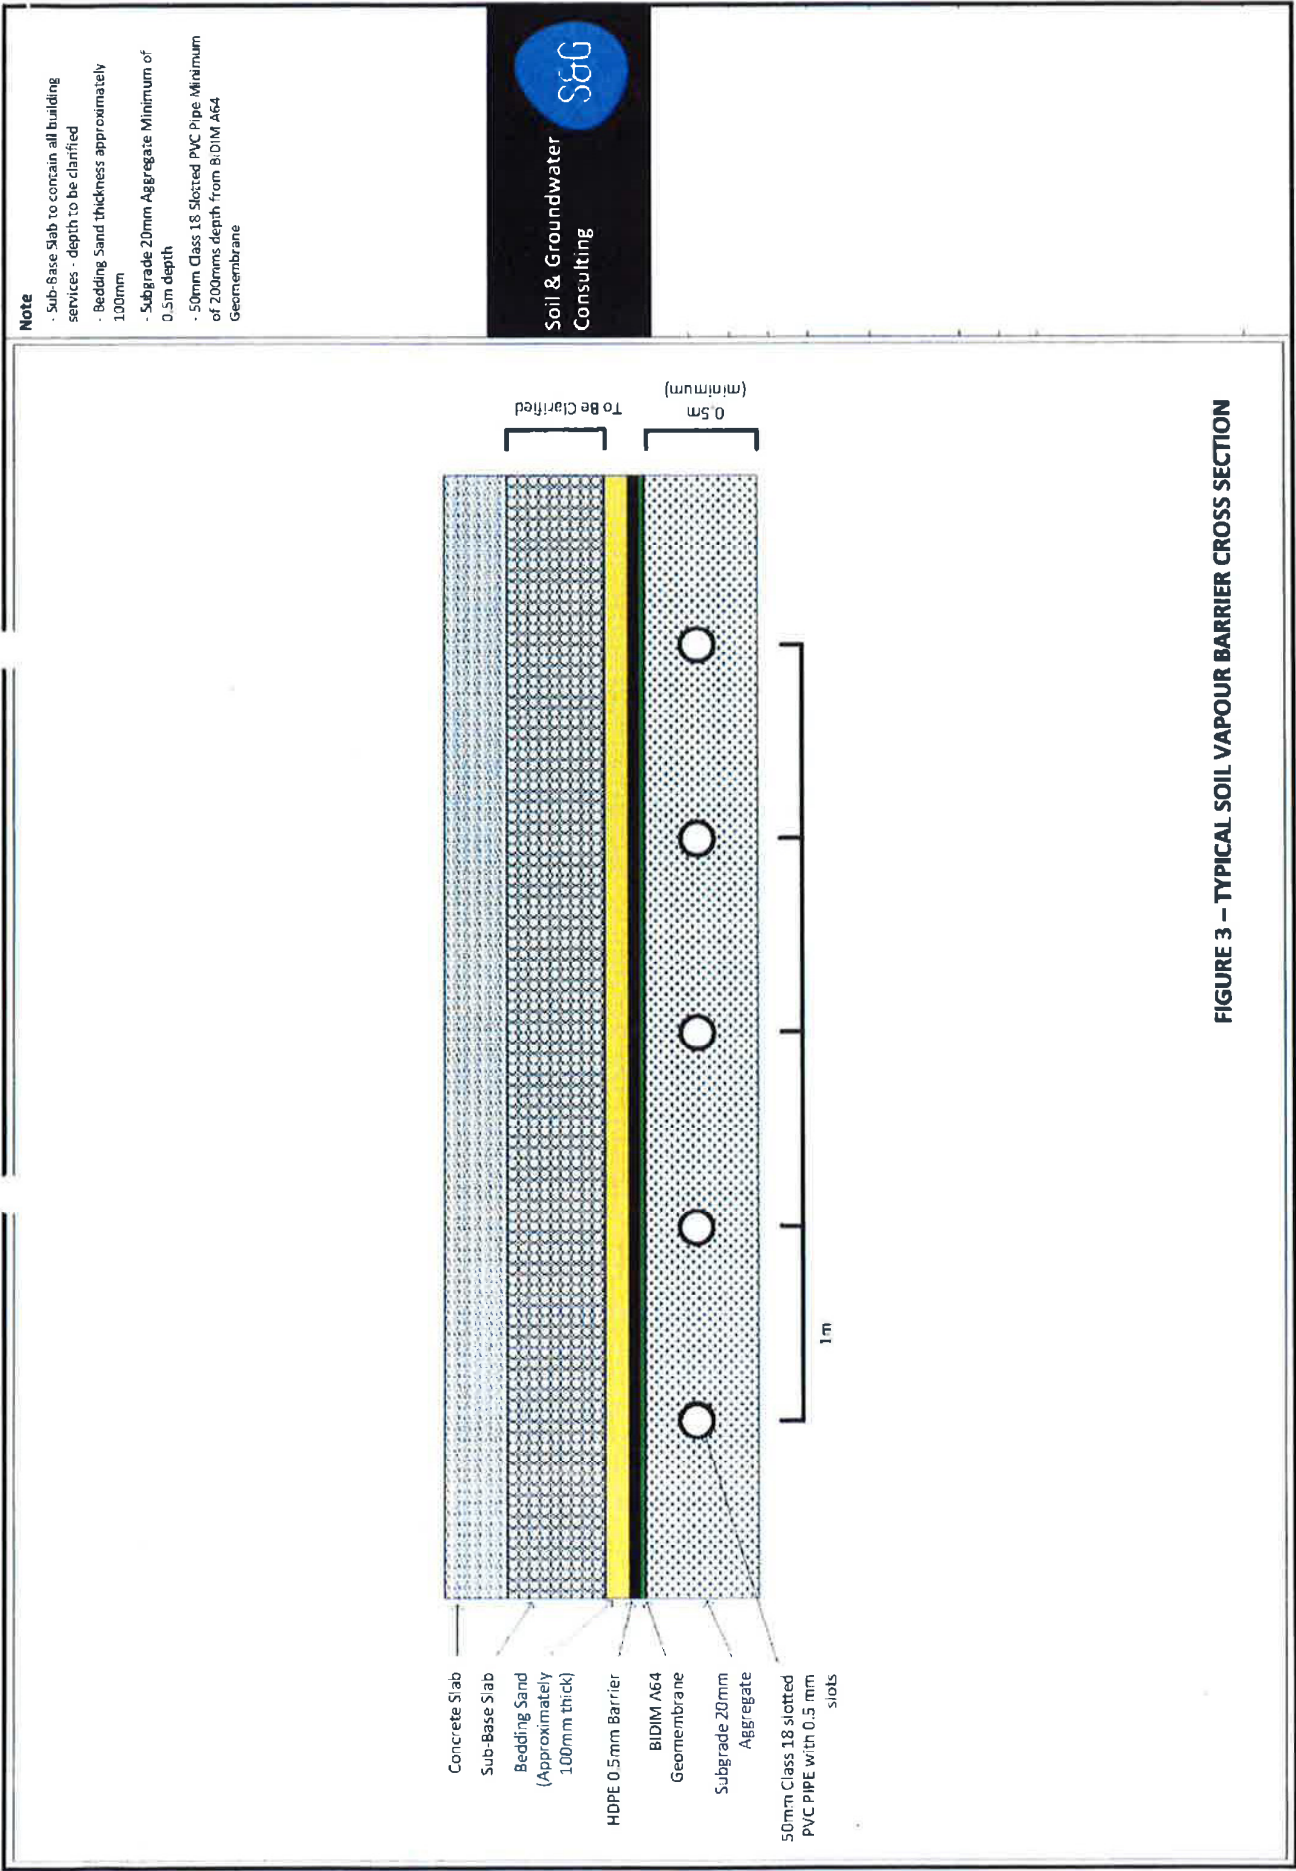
TYPICAL SOIL VAPOUR BARRIER CROSS SECTION
